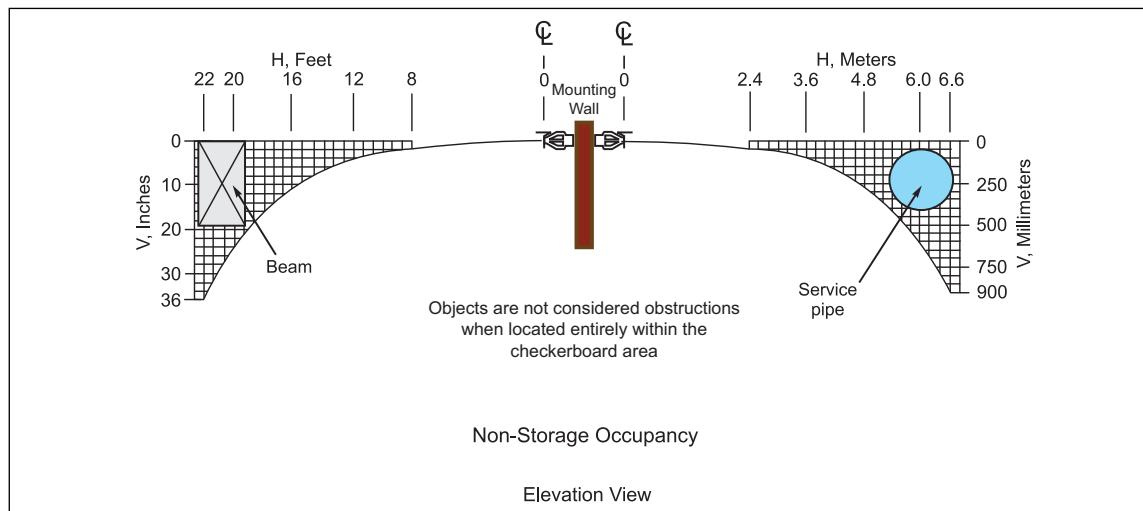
(b). Objects near ceiling level not considered obstructions to extended-coverage Nonstorage sidewall sprinklers away from the mounting wall
